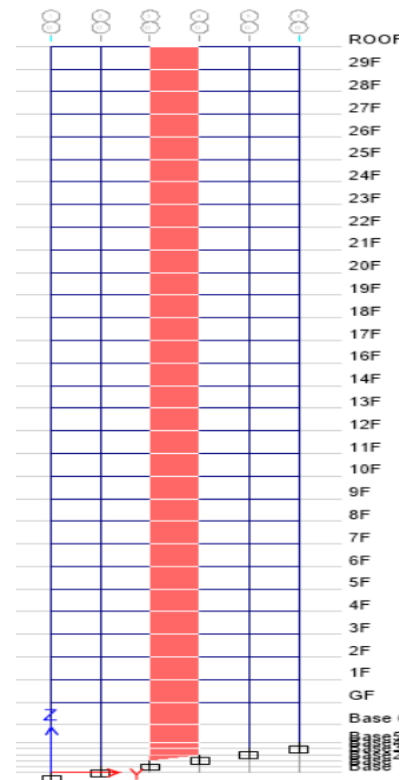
Elevation view of without outrigger bracing system for 10 degree sloping ground.
